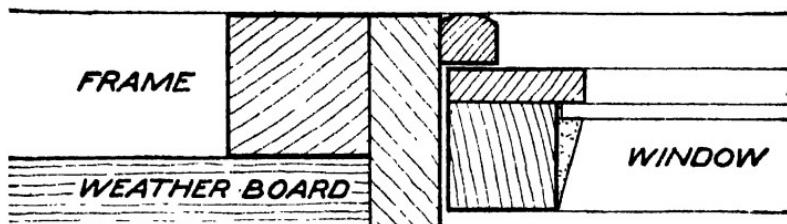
PLAN SECTION THROUGH WINDOW.
